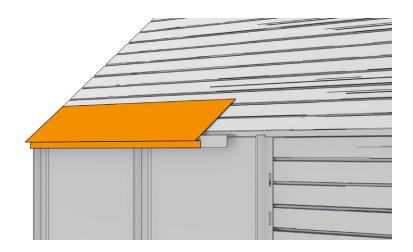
ASSEMBLY OF PANELS TO THE "J" STRIP
